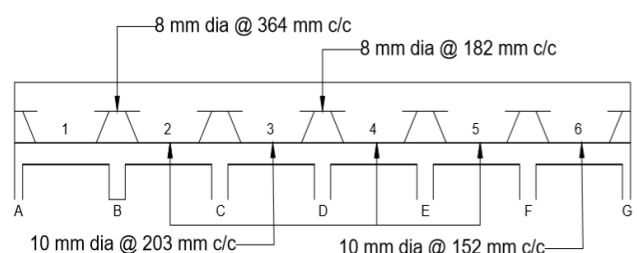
Detailing Diagram for continuous oneway slab
